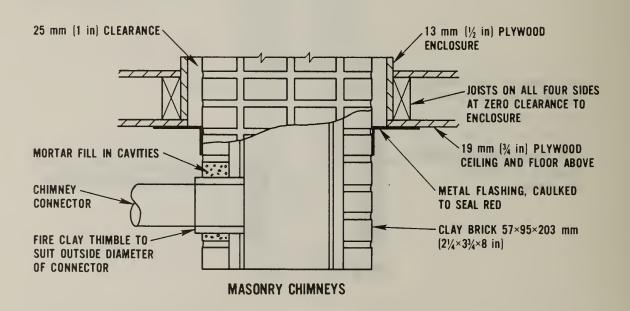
Details of the Construction of Combustible Enclosures Used to Surround Chimneys 1 through 4.
